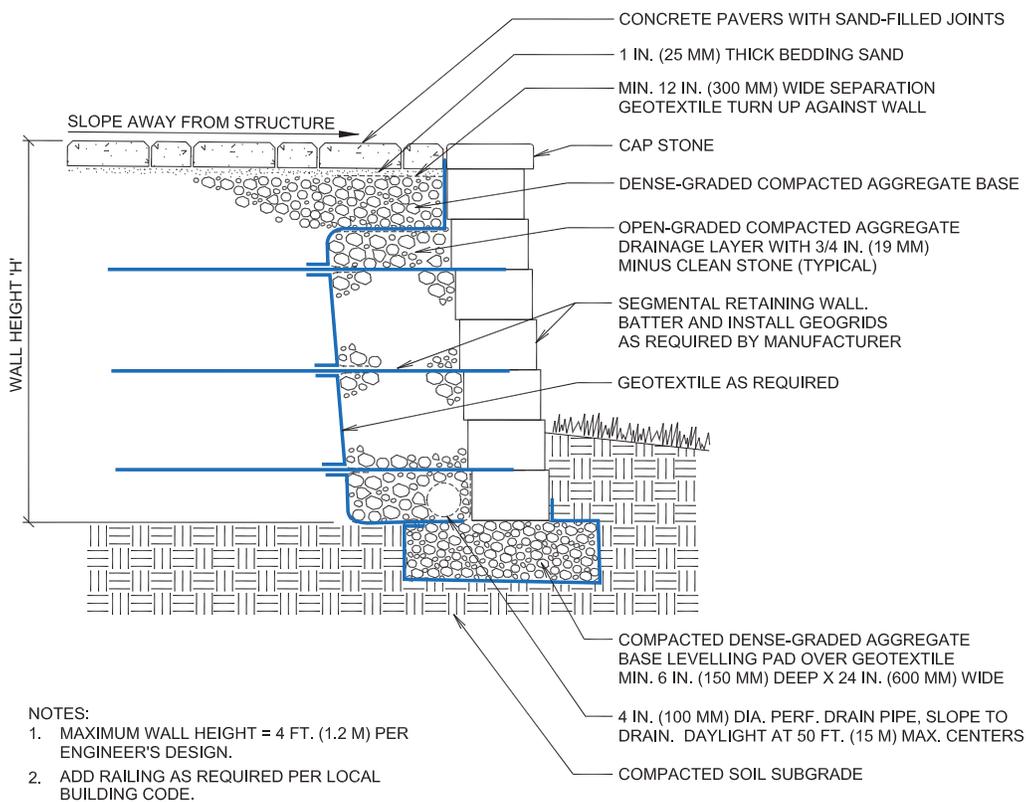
Raised patio with geogrid reinforced segmental retaining wall
